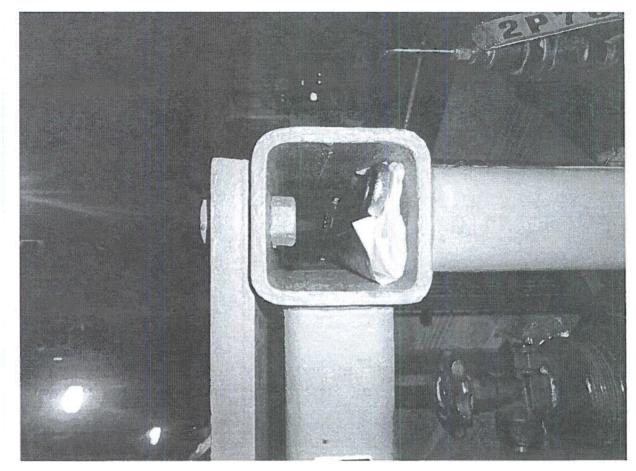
Wrench inside Top Structural Steel Tube of N2 Rack
